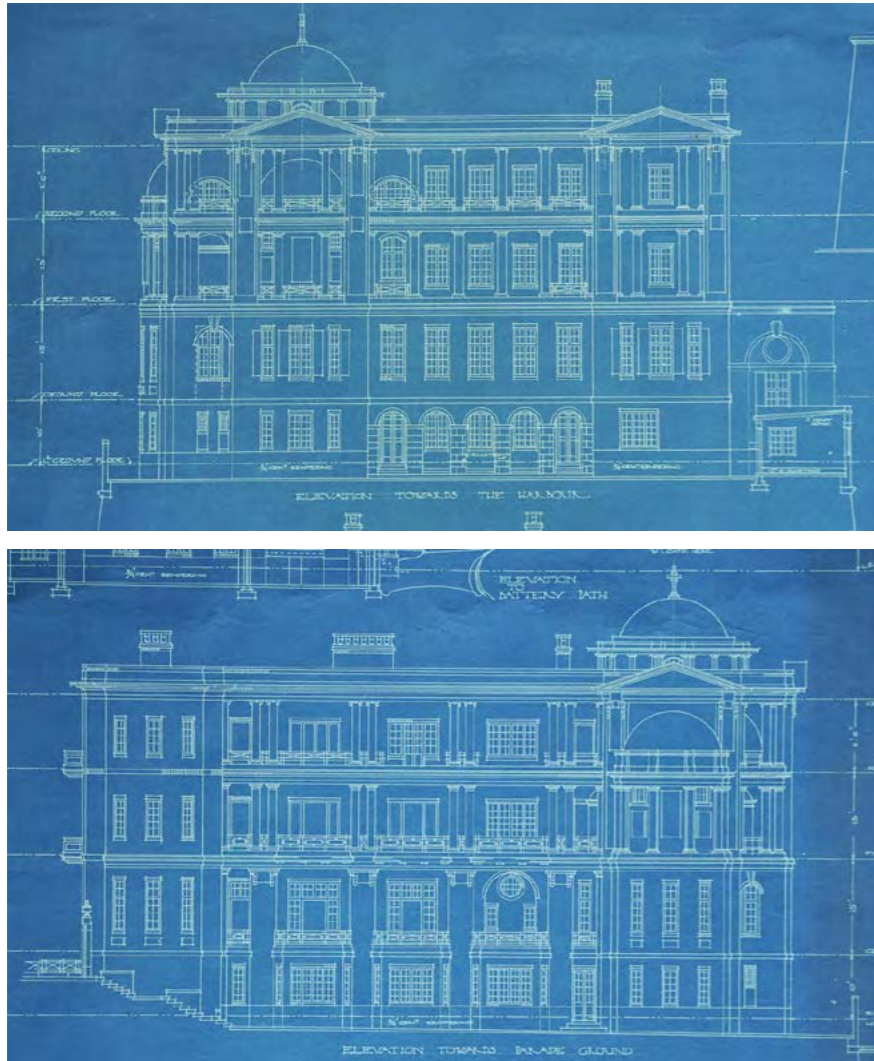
Northeast elevation facing harbour (top) and southeast elevation with verandahs facing the parade ground (bottom) of French Mission Building, 1915. These drawings reflect the design intent of the building, which was very much the same as what was actually built in 1919, except that the entrance tower which was absent on the elevation. [Source: "Inland Lot 82, section A, n1 Battery Path," 1915, retrieved on 27/05/2015, Paris, Missions Etrangères de Paris, Archives, K CHI 531]
